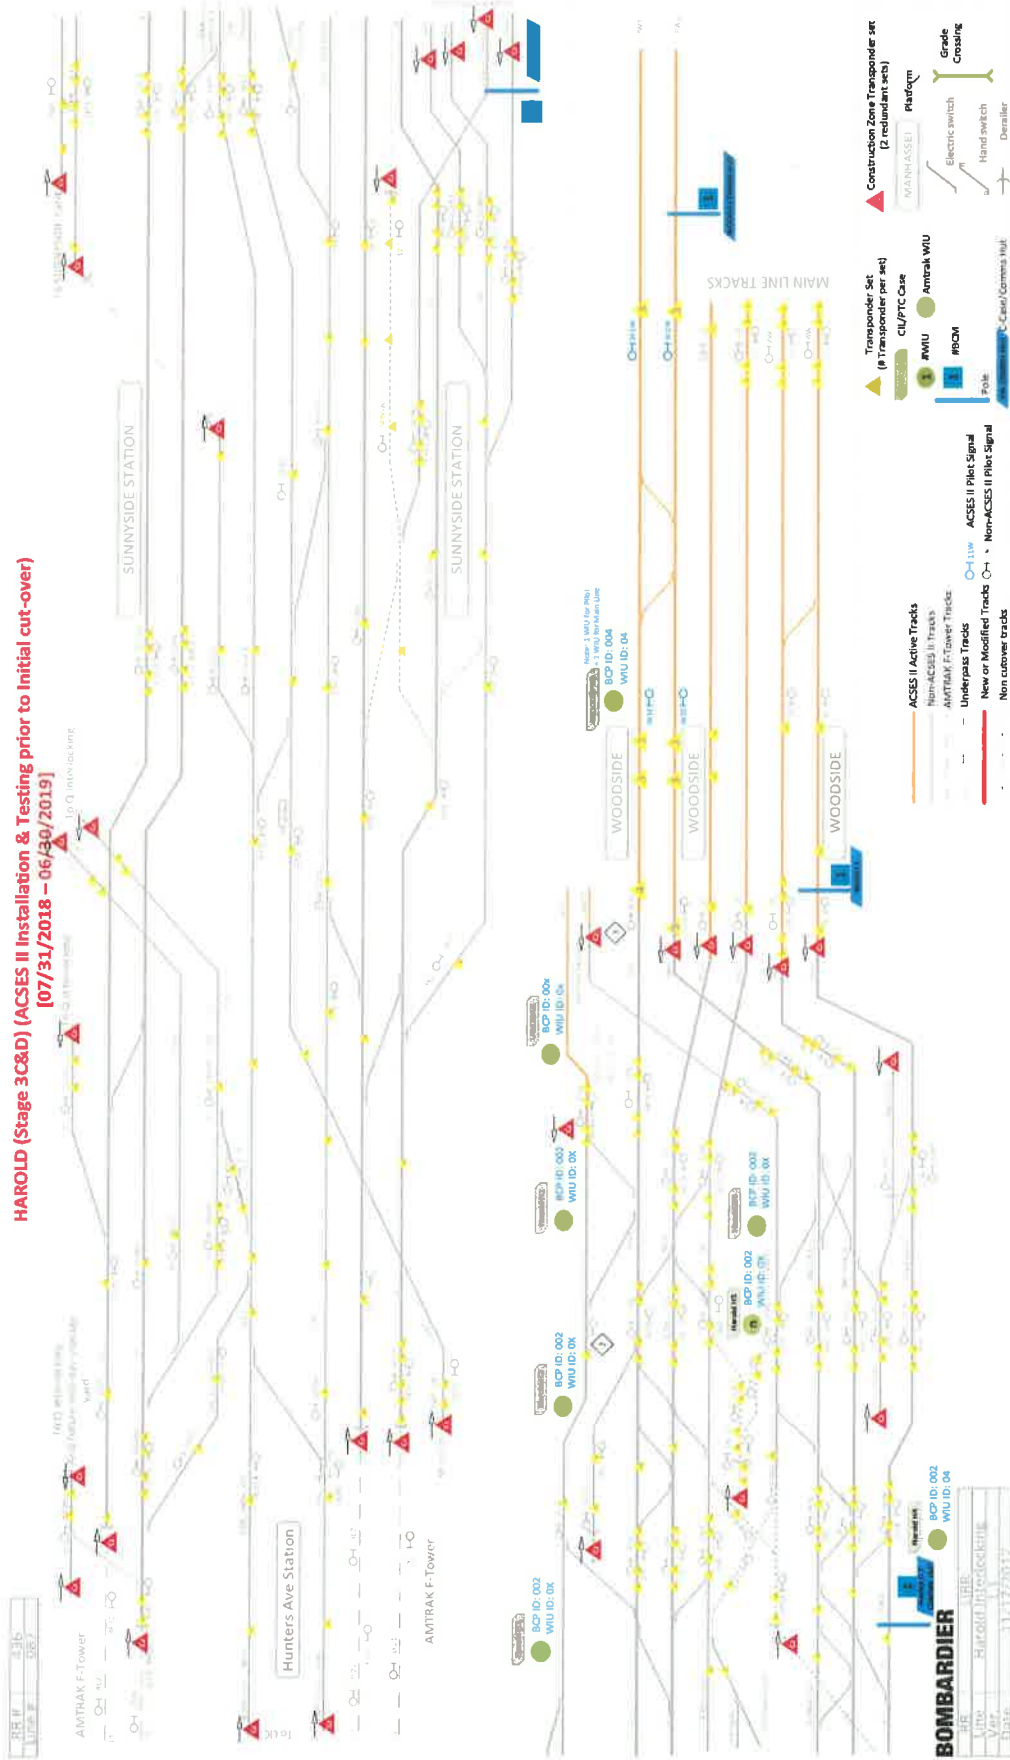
Harold Stage 3C&D layout (ACES II Installation & testing prior to cut-over).
